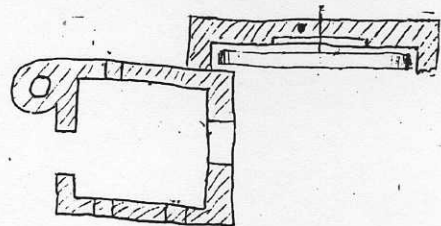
Sketch plan of engine house and fly-wheel arrangement.
